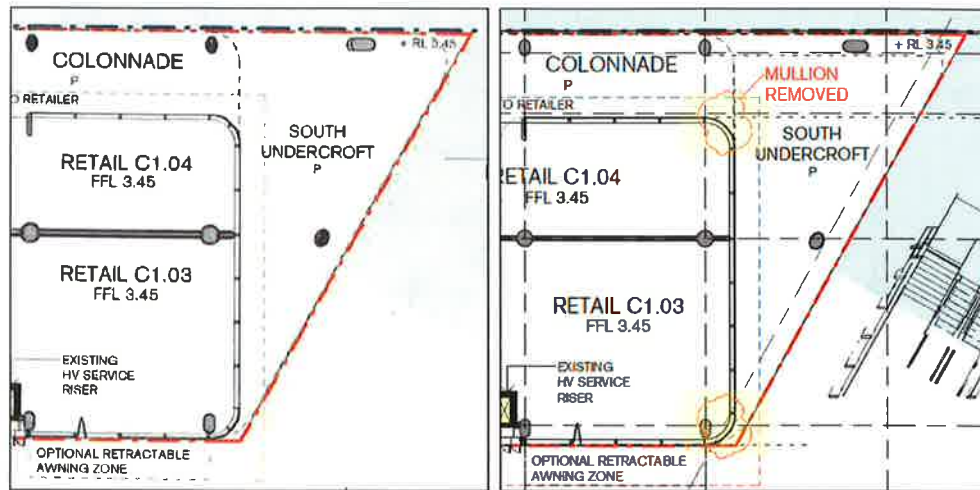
| The approved (left) and proposed (right) retail ground floor tenancies with the proposed removed mullions identified by the yellow shading (Source: Applicant)
